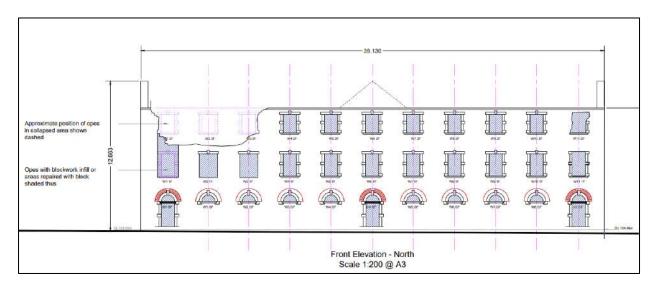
Front elevation, North of Drumgoff Barracks, extract from Joe Byrne Surveys.
